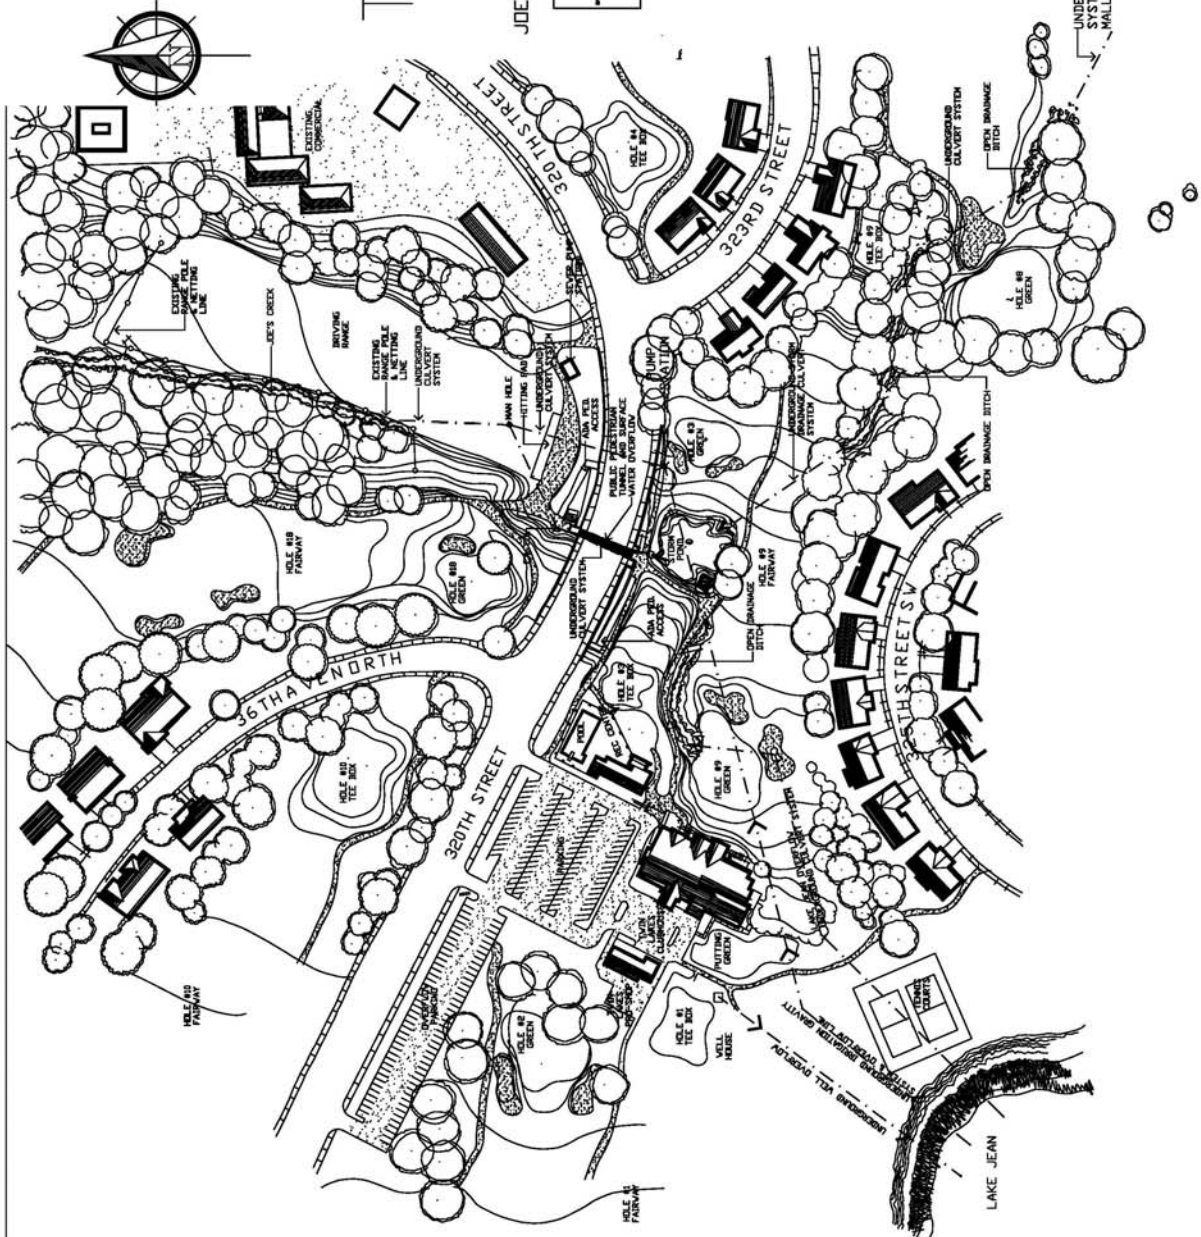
Twin Lakes Golf Course Site Plan, Existing Condition
